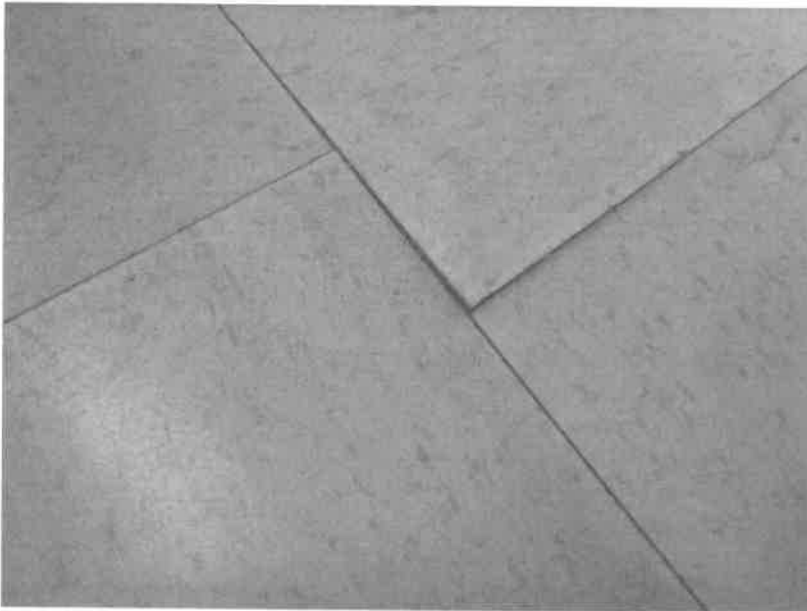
Damaged flooring in one area of elevated moisture levels in floor in reception area
